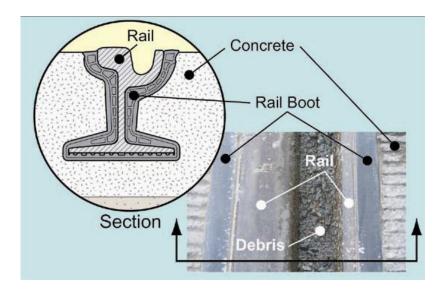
Cross Section of Trolley Rail and Rubber Boot Embedded in Concrete in the Field
